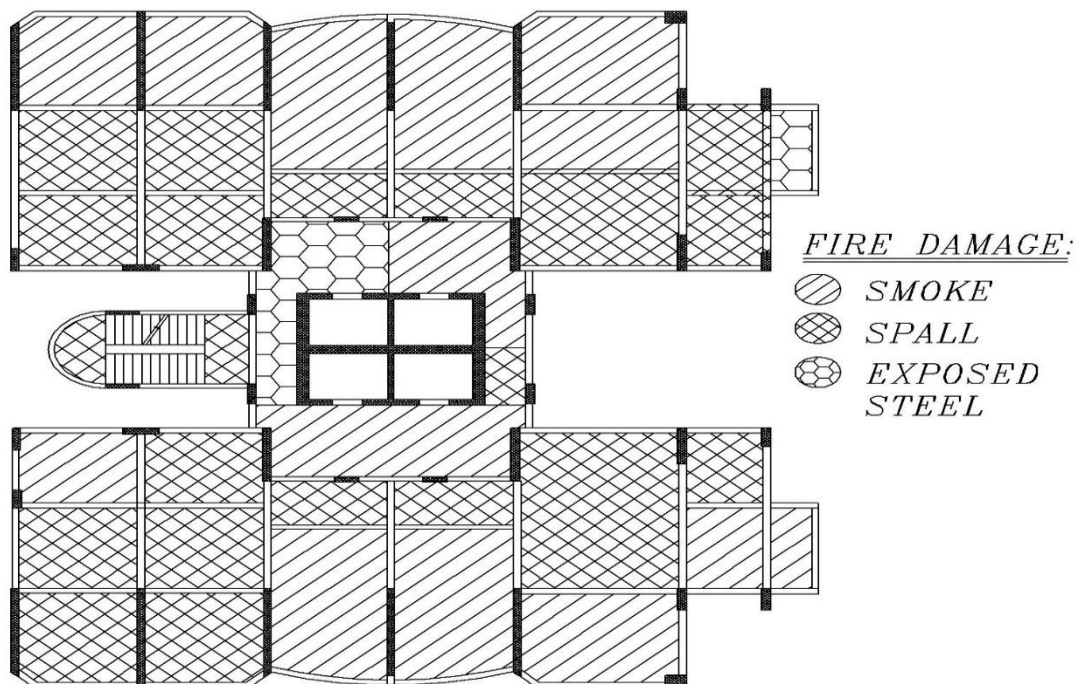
fire damage to 7<sup>th</sup> floor slabs zone1
